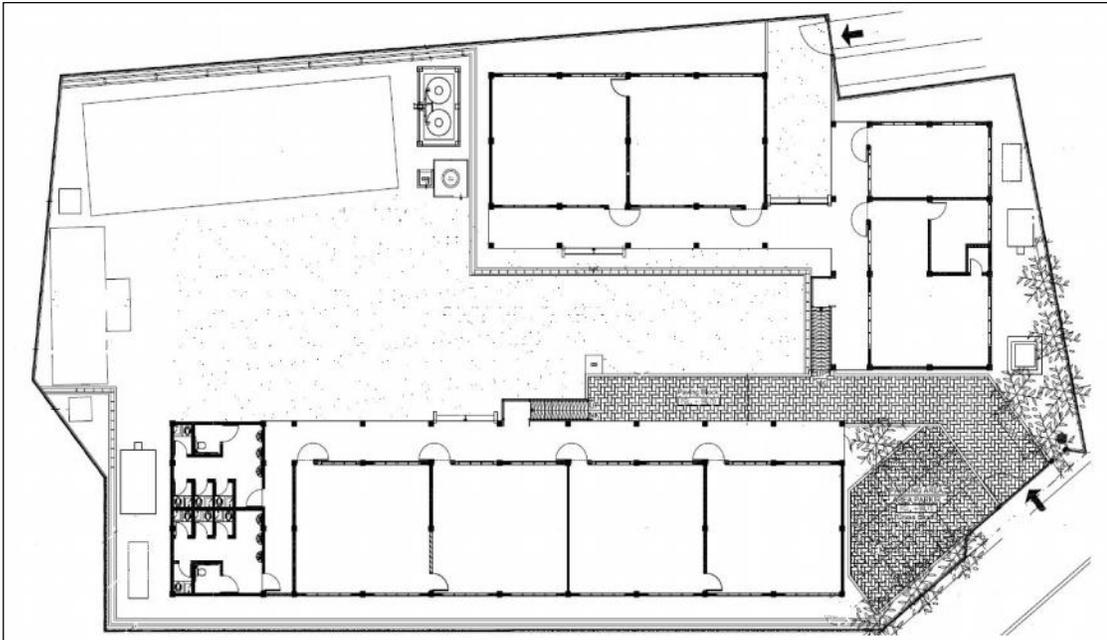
Layout plan of the building blocks of SDN Kayee Lhee
